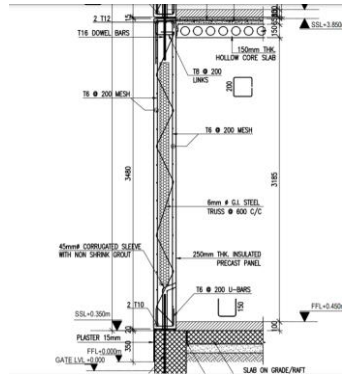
Detailed drawing of as-built exterior precast wall of both PC01 and PC02.
